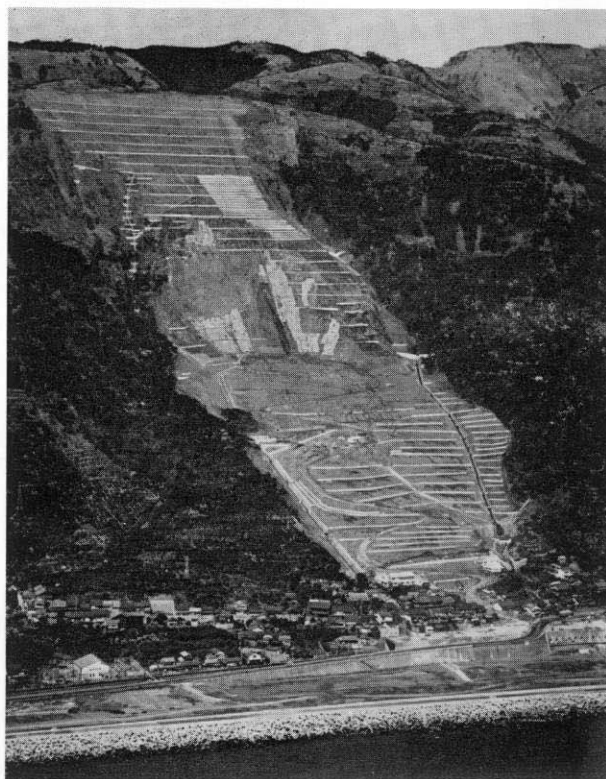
(a) Excavation of soil mass at the Yui sliding area
